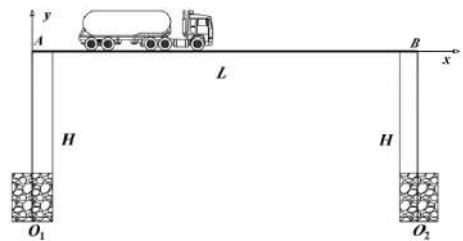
Calculation scheme of a single-span beam bridge with moving loads
